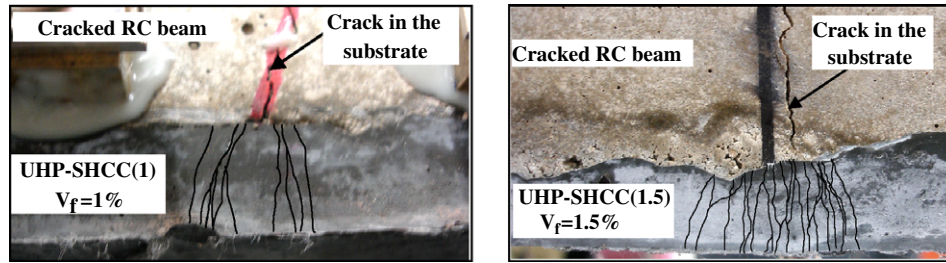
Crack distributions within repair layers adjacent to existing cracks.
